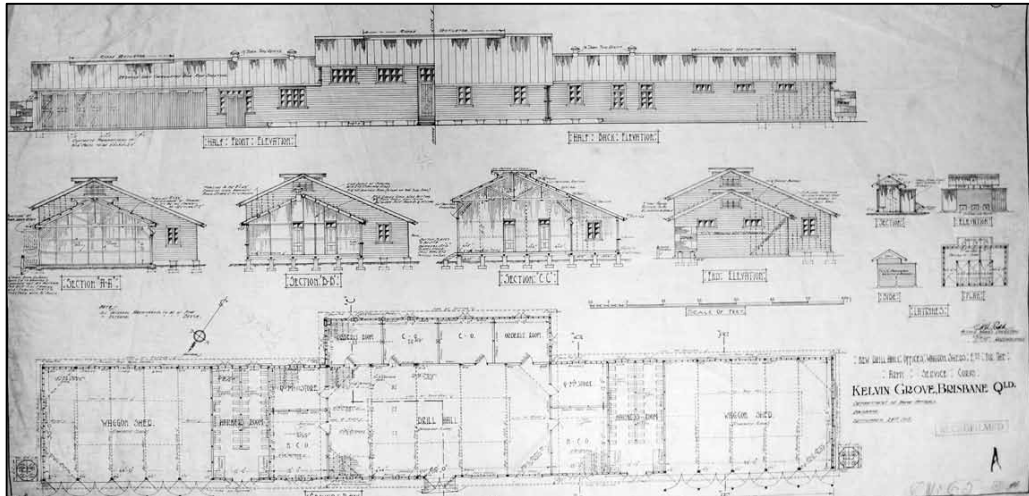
Australian Army Services Corps drill hall and wagon shed, plans and elevations, 1915 (Source: QUT Archives)
